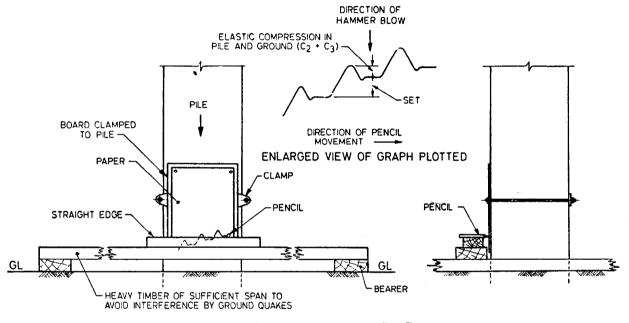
TYPICAL ARRANGEMENT FOR A SET RECORDER
